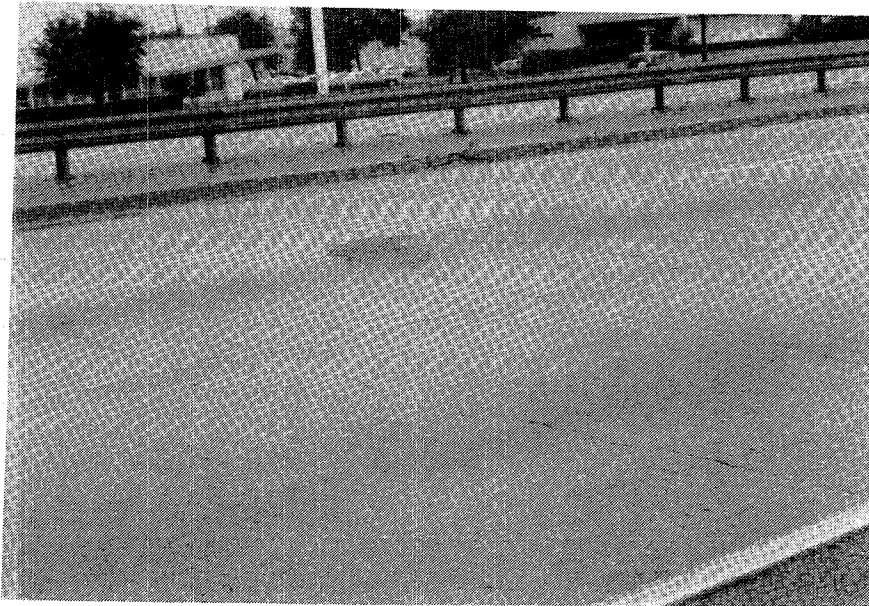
Illustration of a localized failure on a continuously reinforced concrete pavement (CRCP-8, Dallas, Texas).
